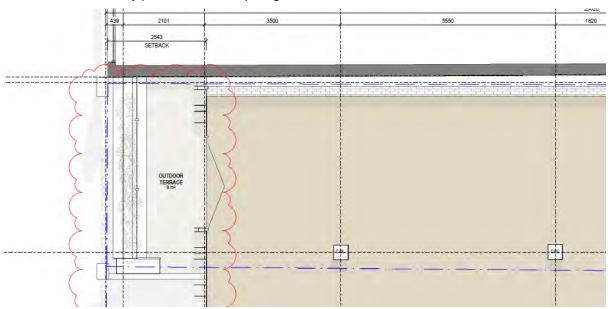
Level 1 plan showing roof terrace above the retained heritage building. From Drawing A1.03
